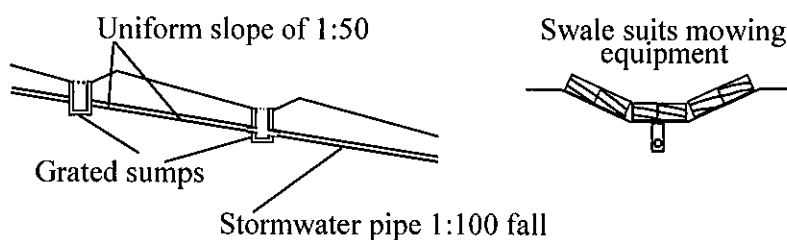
Longitudinal section through a mowable drain, and a cross section showing how the swale should suit the mowing equipment.
